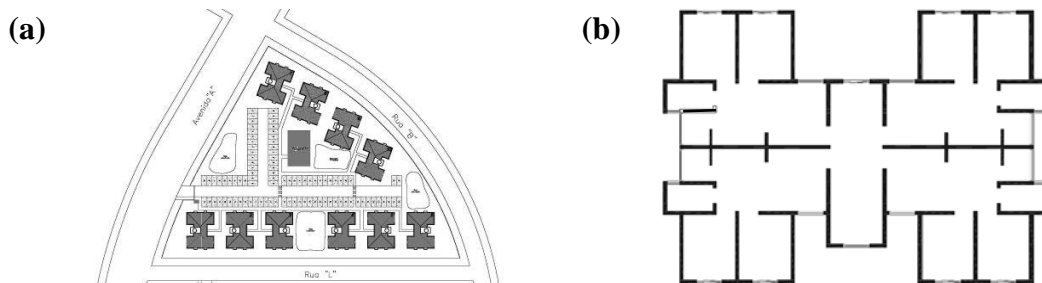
Illustrative example of project PAR 4: (a) layout of buildings and (b) plan view of a building with 4 apartments per floor
